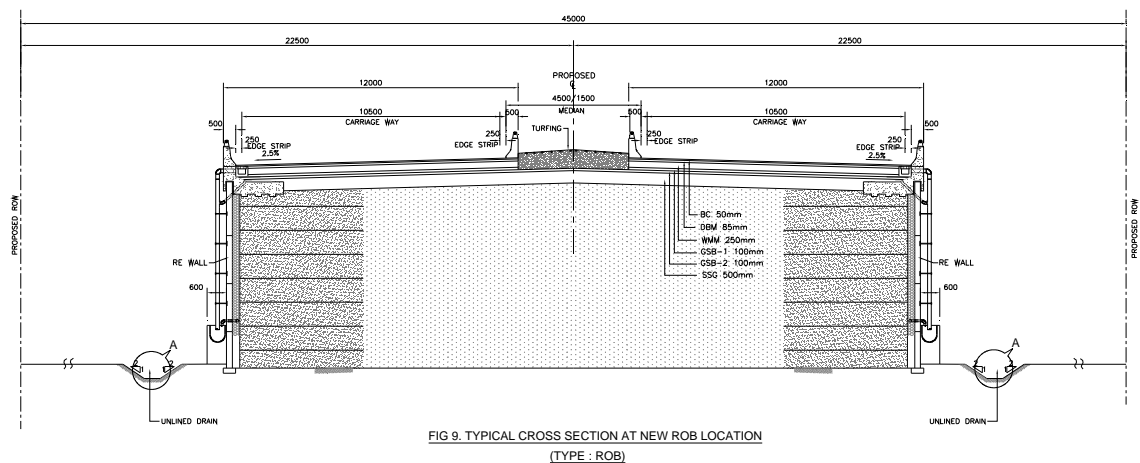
TYPICAL CROSS SECTION AT NEW ROB LOCATION
